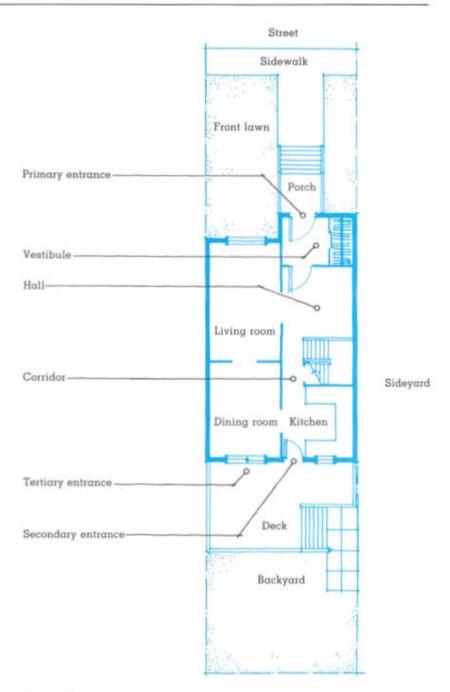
Plan illustrating definitions of entrances, vestibules, halls and corri-
